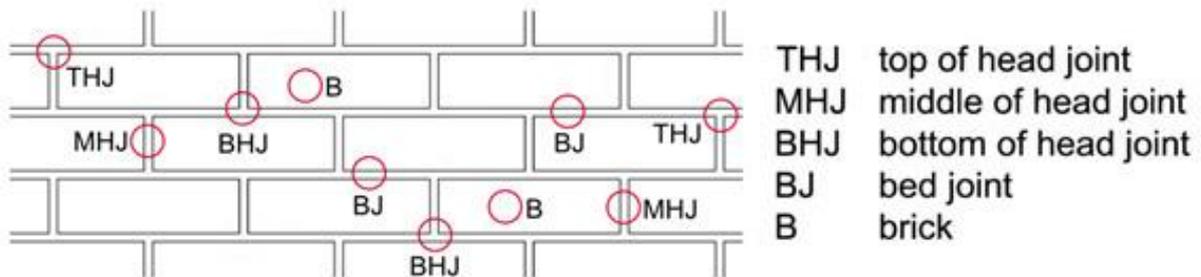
Positions have been marked on a drawing where tubes are to be installed.
